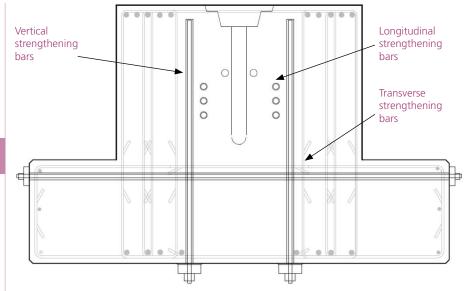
Strengthening reinforcement to be installed within the crosshead cantilevers
